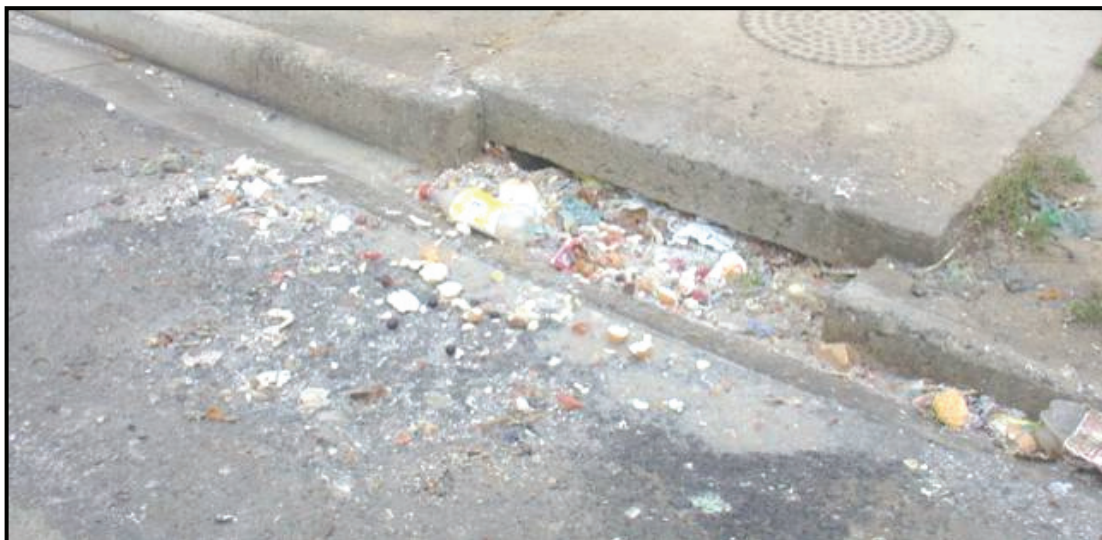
Blocked stormwater drain on Drommedaris Road
